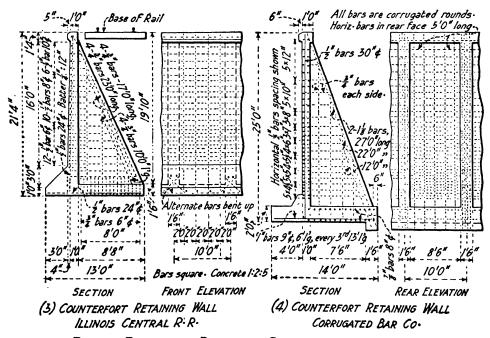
Examples of Reinforced Concrete Retaining Walls.
